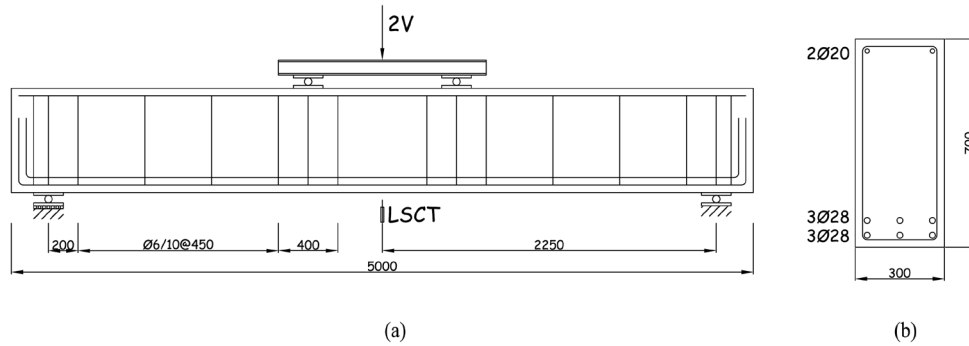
Test setup. (a) longitudinal section, (b) cross section.
